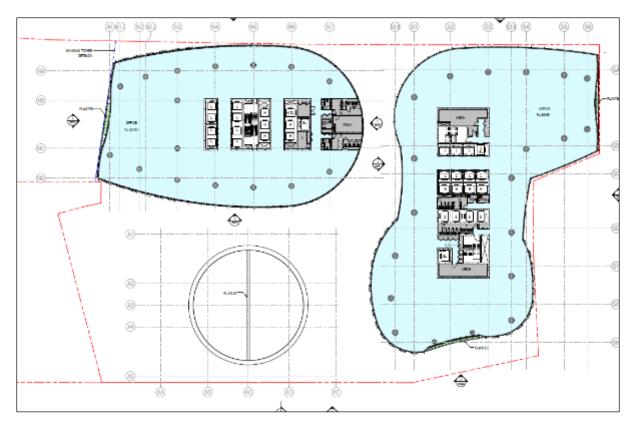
Typical Levels 10-15 and 18-22 Floor Plan
